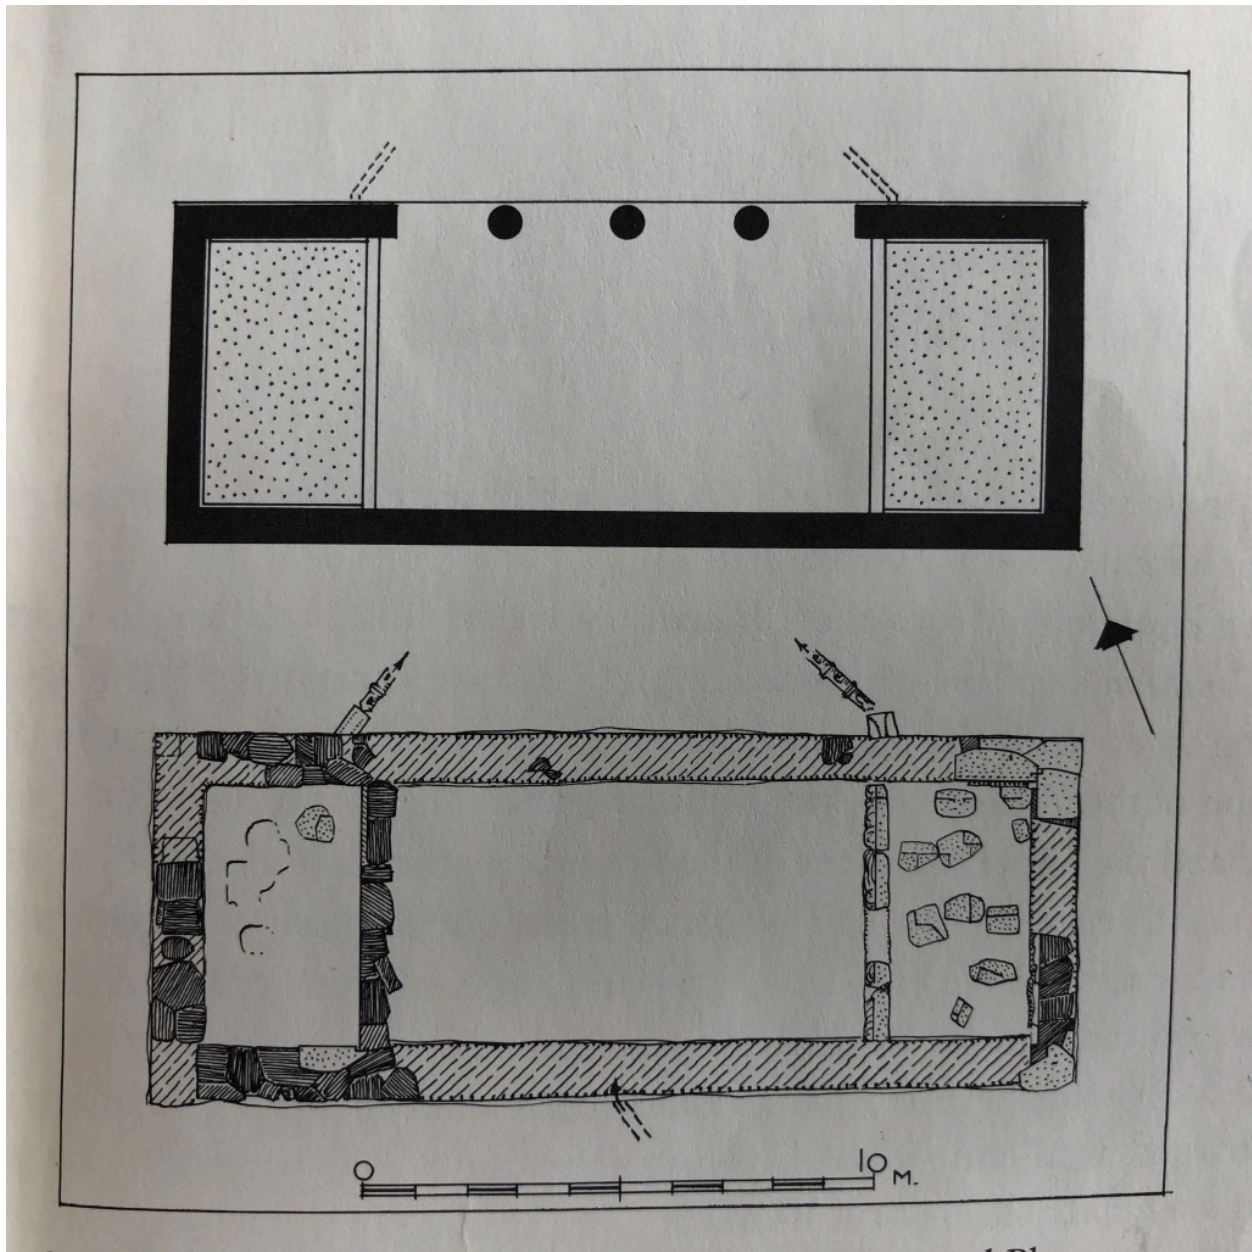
Archaeological Drawing and Plan of the Southeast Fountain House
